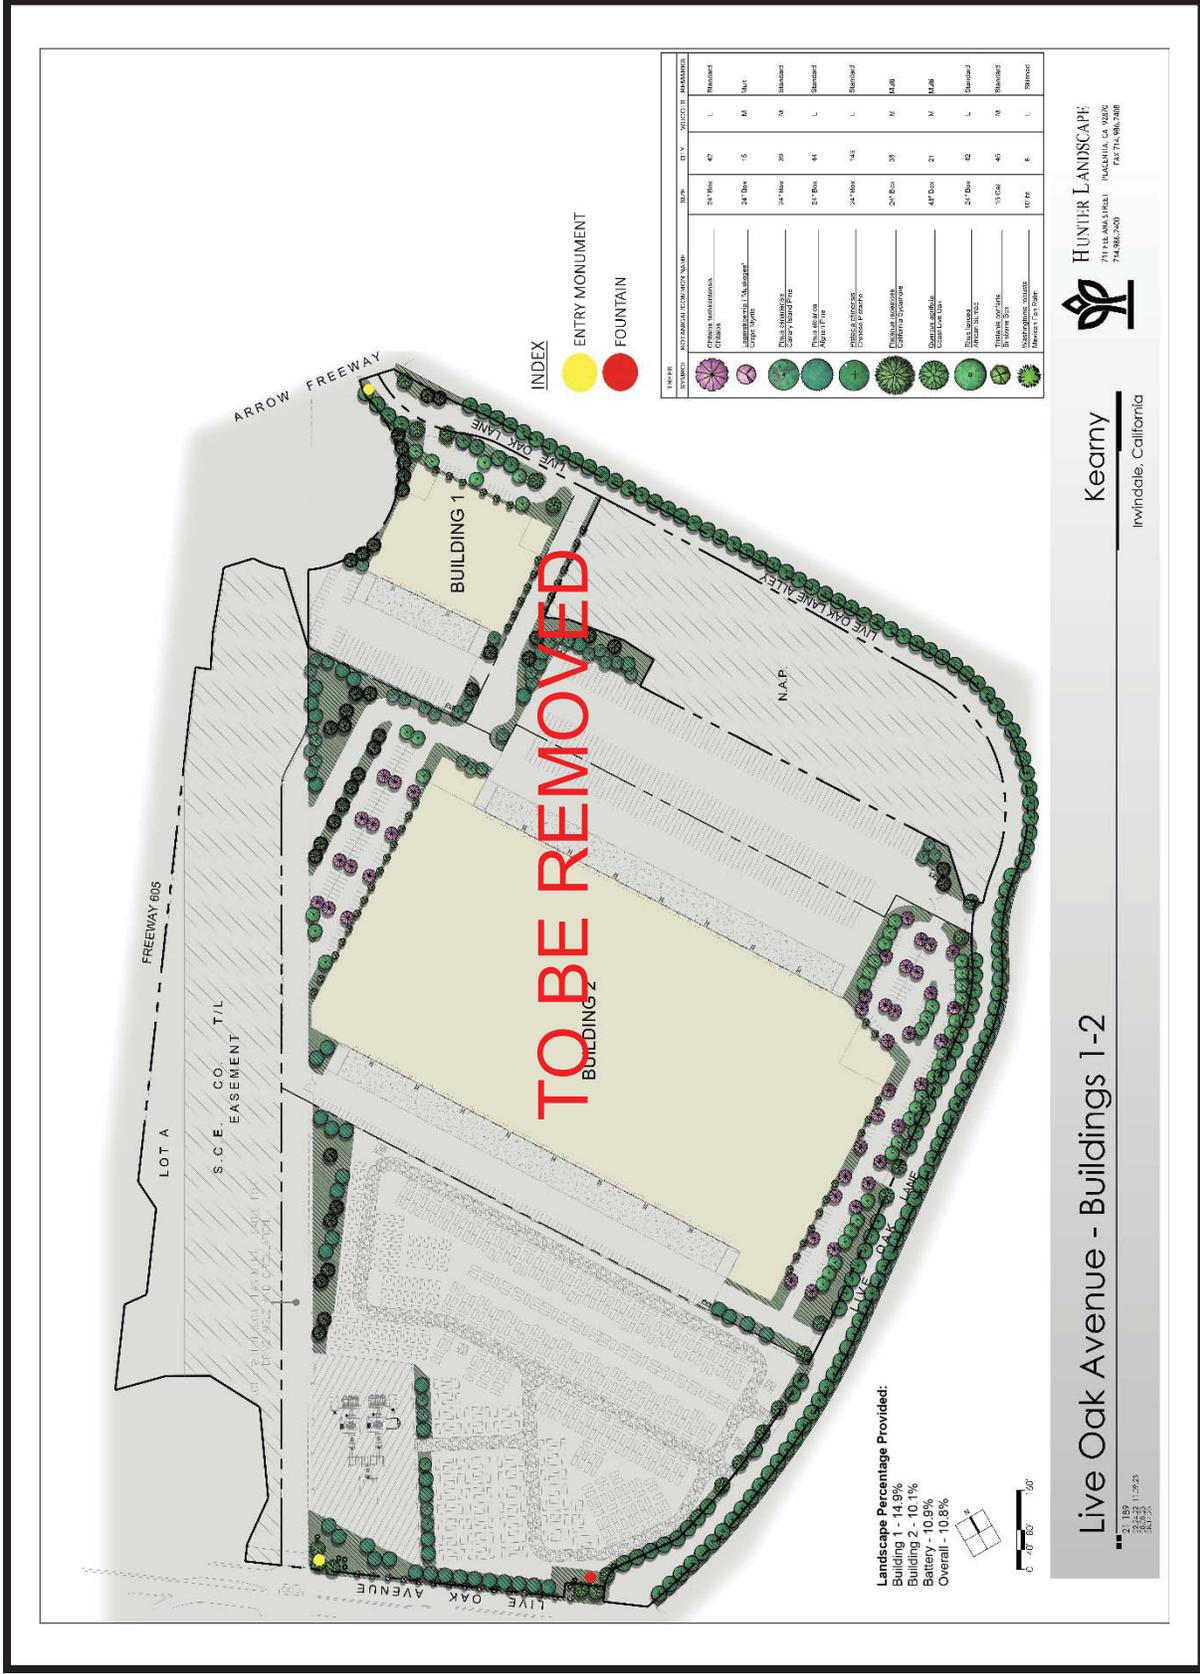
CONCEPTUAL LANDSCAPE PLAN WITH BESS
